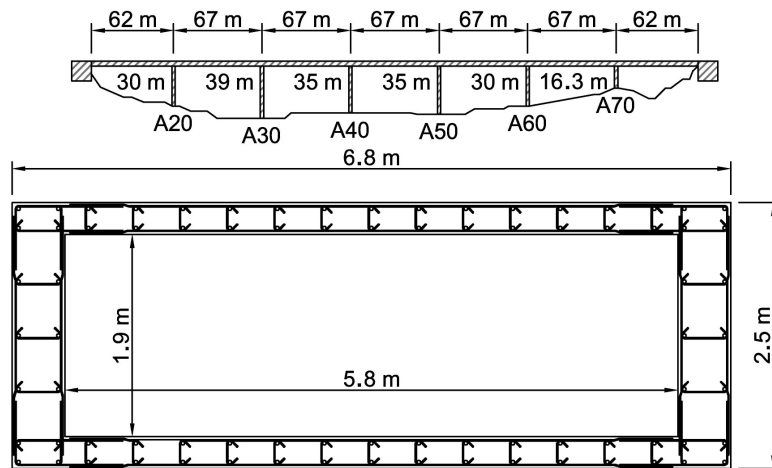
Wrath Bridge in Austria: elevation and pier cross section
